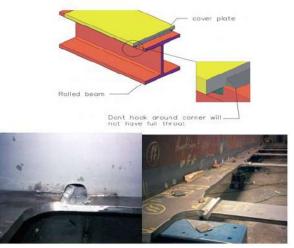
The fillet welds holding this cover plate to the beam.
